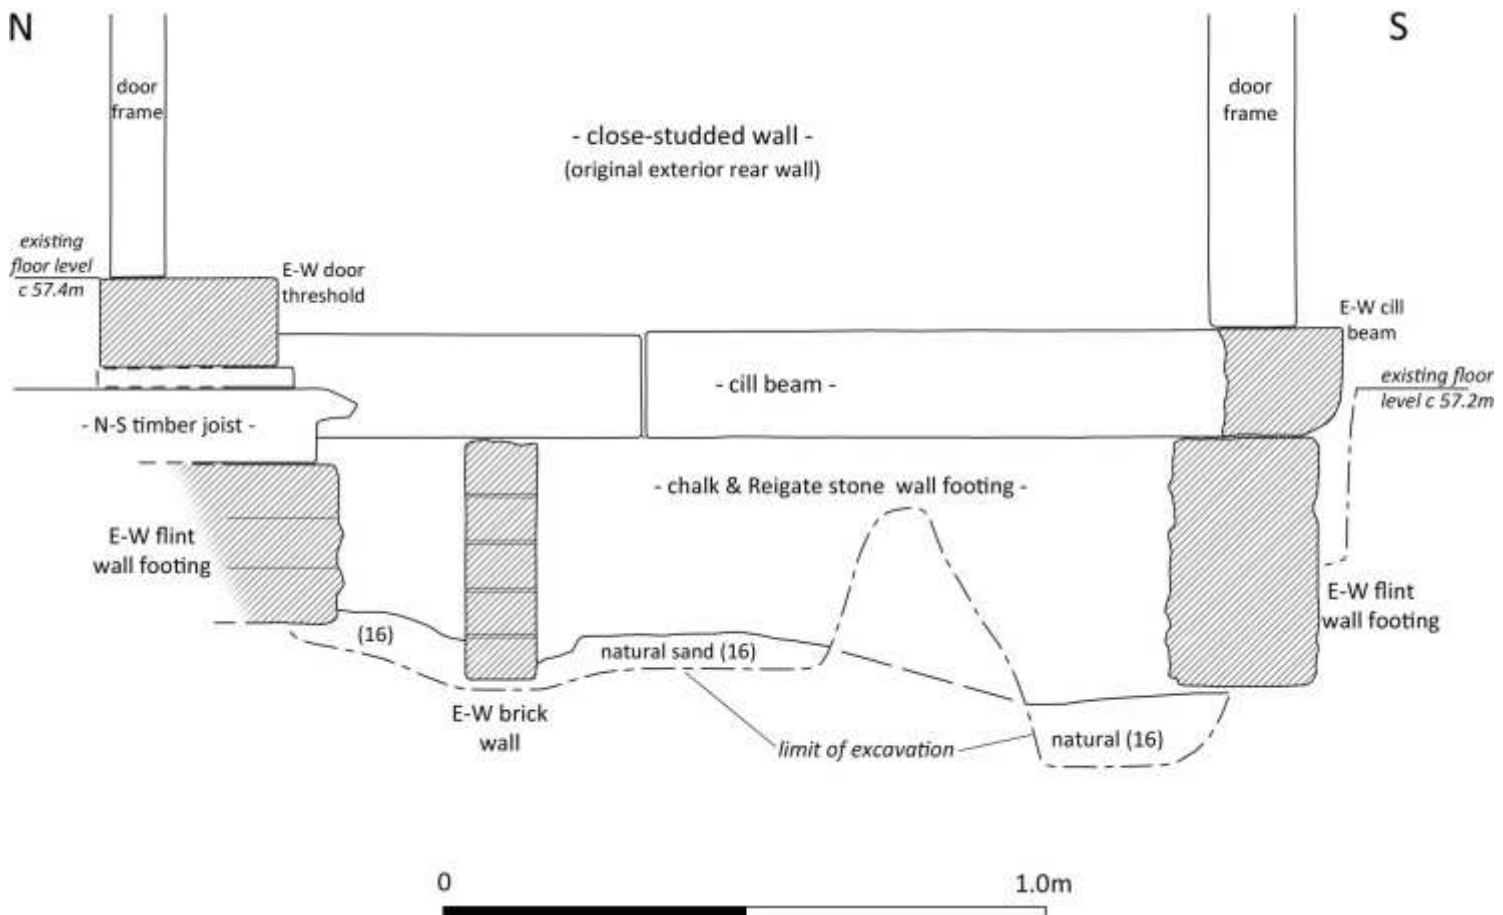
Combined section and elevation, showing the various elements of Corridor G-09 and to the rear the original external western wall plinth and cill beams
